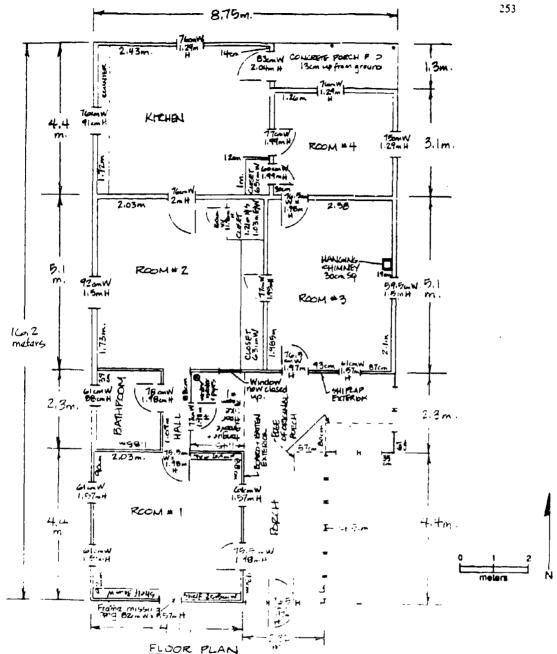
Field architectural floorplan of the dwelling at 41CO121.
